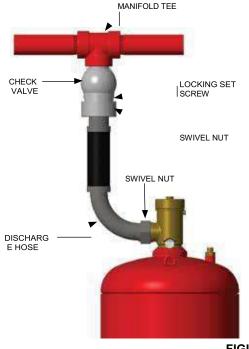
80 mm (3 IN.) HOSE/CHECK VALVE INSTALLATION: Part No. 300013
